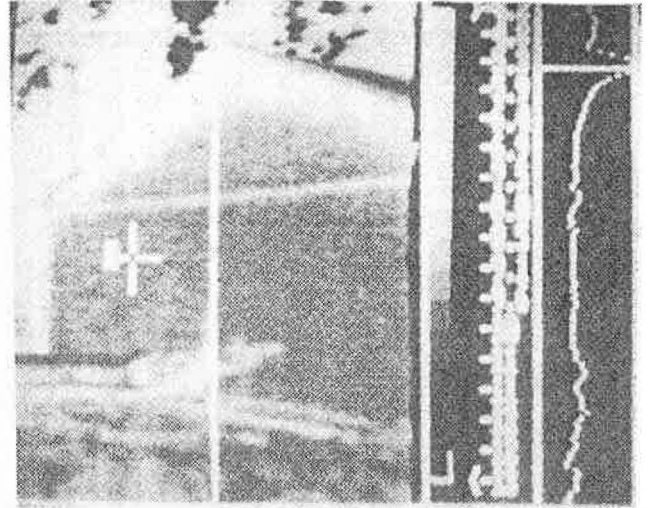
A section of the external wall after the retrofit showing a successful replacement of the insulation of the external wall, but a remaining air leak path in the joint between the external wall and the attic (compare with Figure 3).
